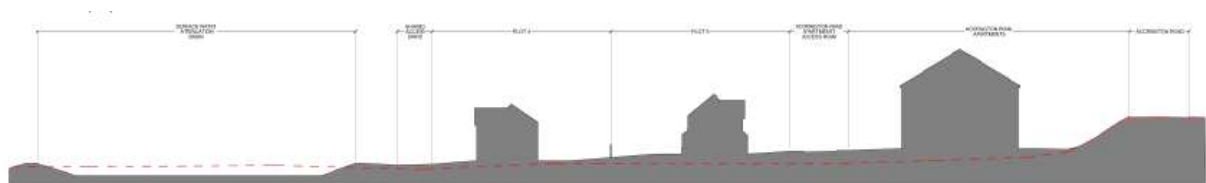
Proposed site section showing north (right) Accrington Road to south (left) River Calder
